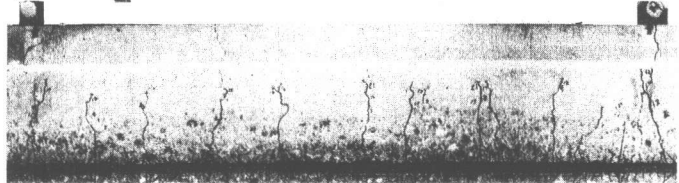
Pattern of internal cracks around main tension bar in beam.
